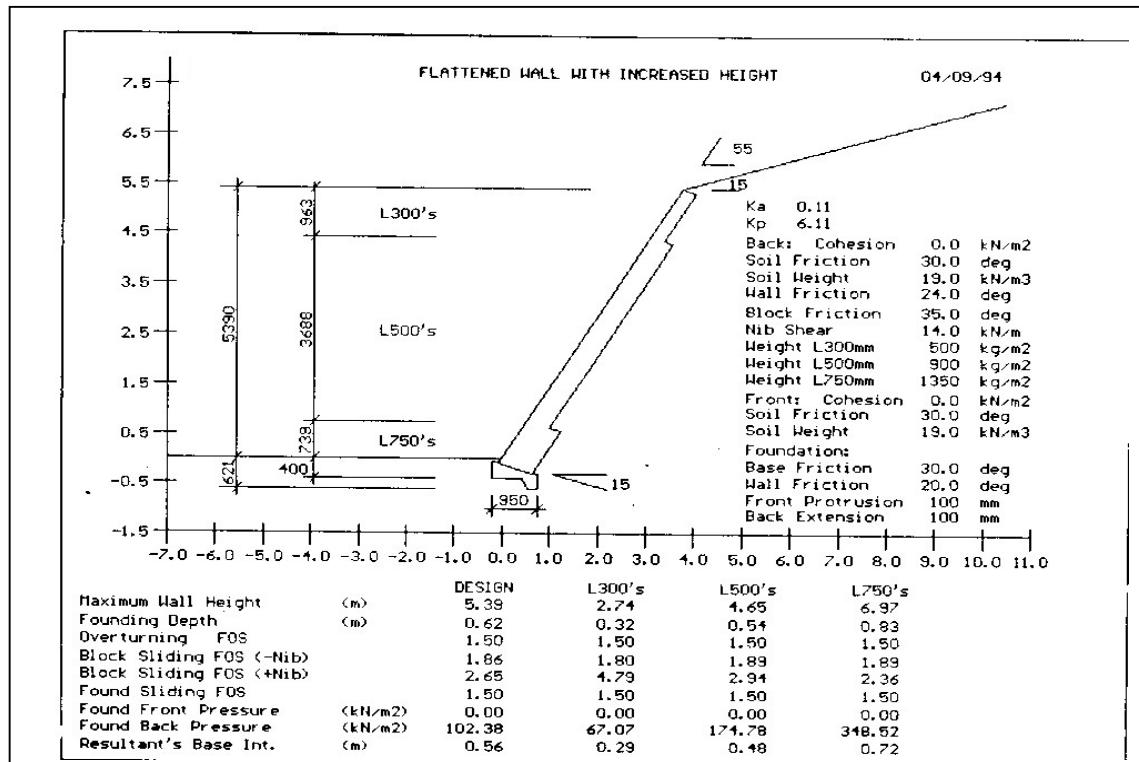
Example showing the improvement in the block mix that can be achieved by flattening the slope of the wall.
